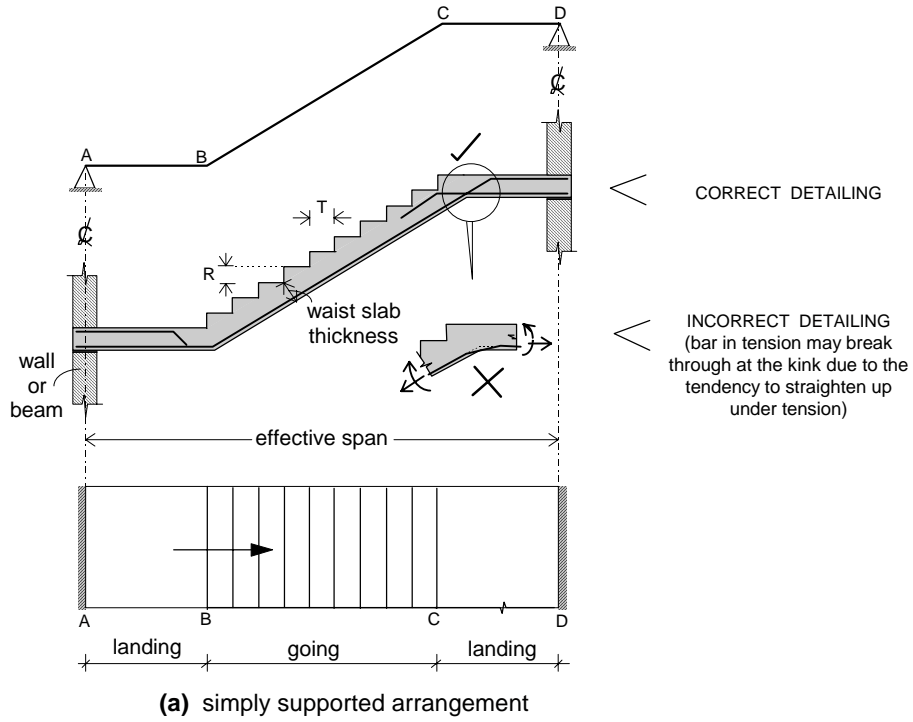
Typical examples of stair slabs spanning longitudinally
